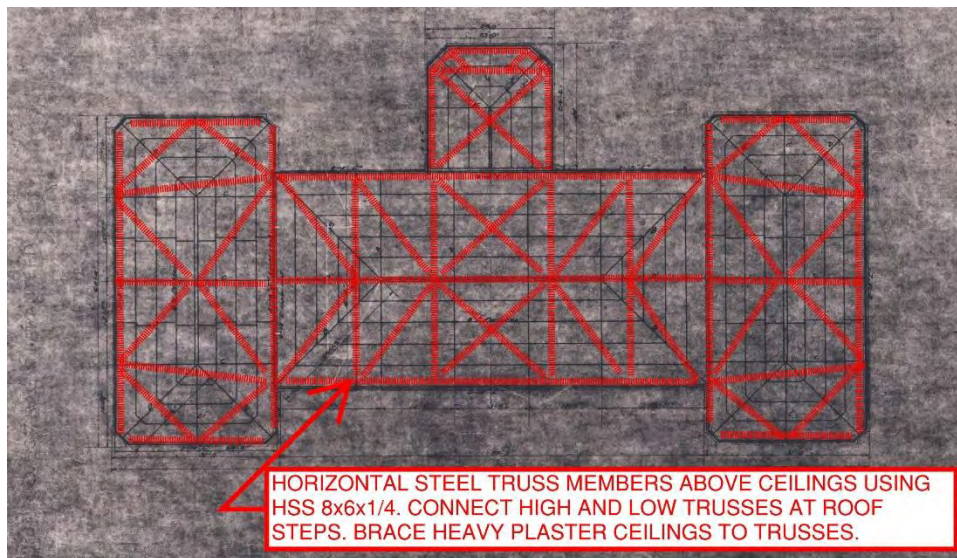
Seismic Retrofit Scheme (Horizontal Steel Diaphragm Trusses) at Ceiling/Roof Trusses Bottom Chords
